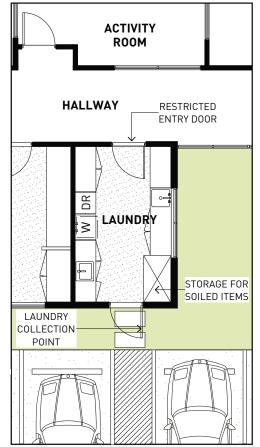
A typical child care facility laundry layout. External access may be provided if laundry is done off site or for deliveries.
